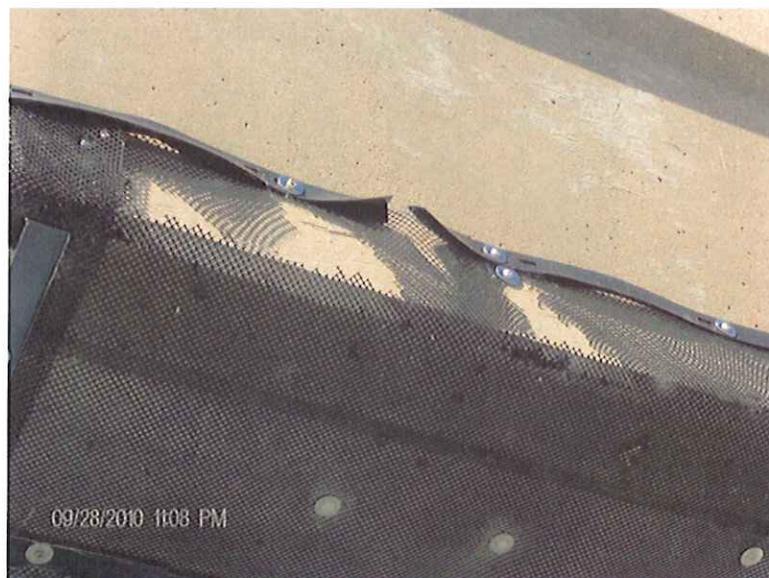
Deck underside - deteriorated netting over Maier Festival grounds
